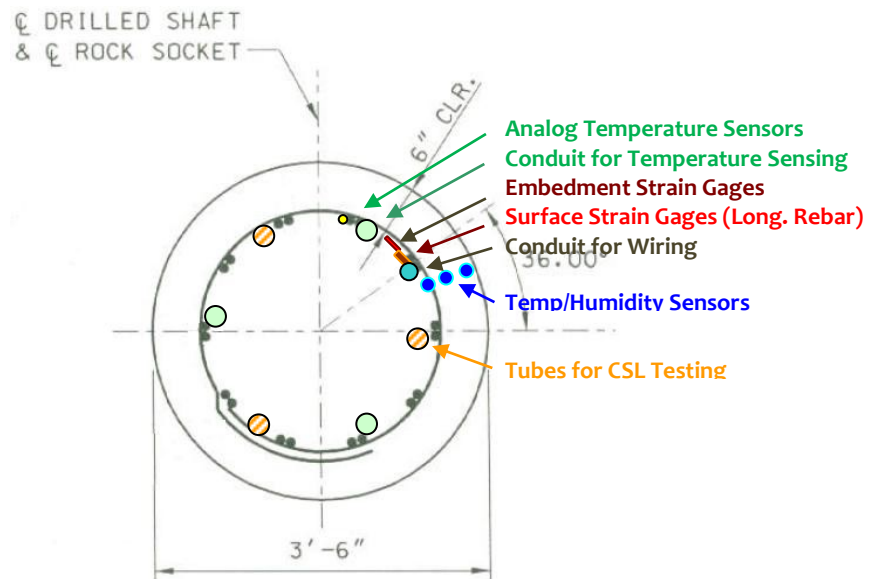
Gage locations for heavily-instrumented caissons. Plan view.
